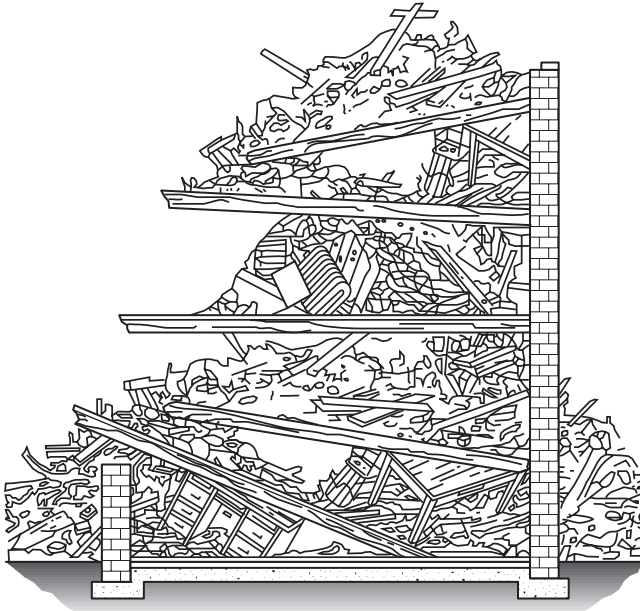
(f)(d) Cantilever floor collapse. (Courtesy of U.S. Department of Civil Defense)
